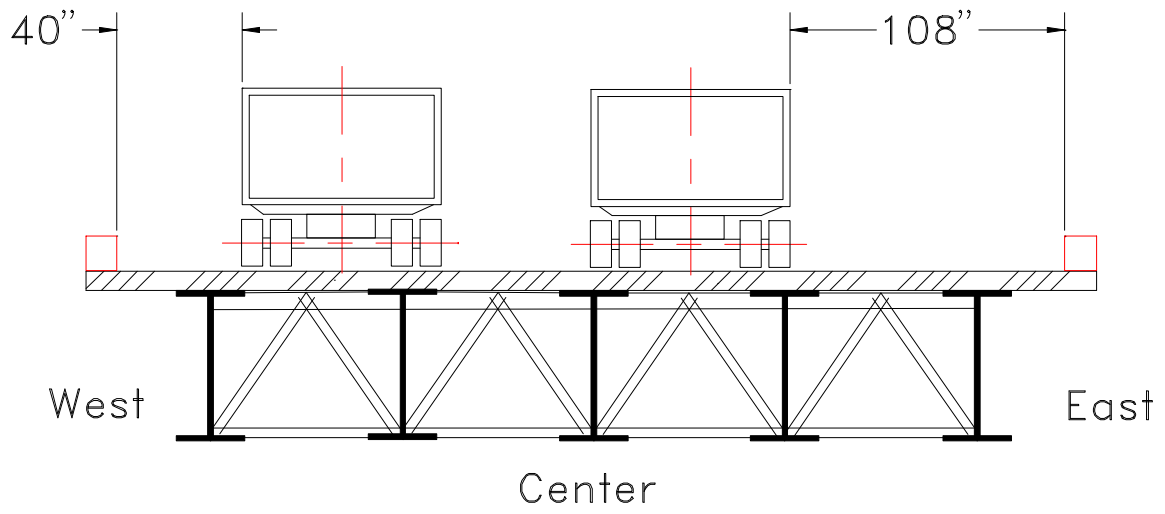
Truck Locations on the Bridge Deck when Doing the Crawl Test
